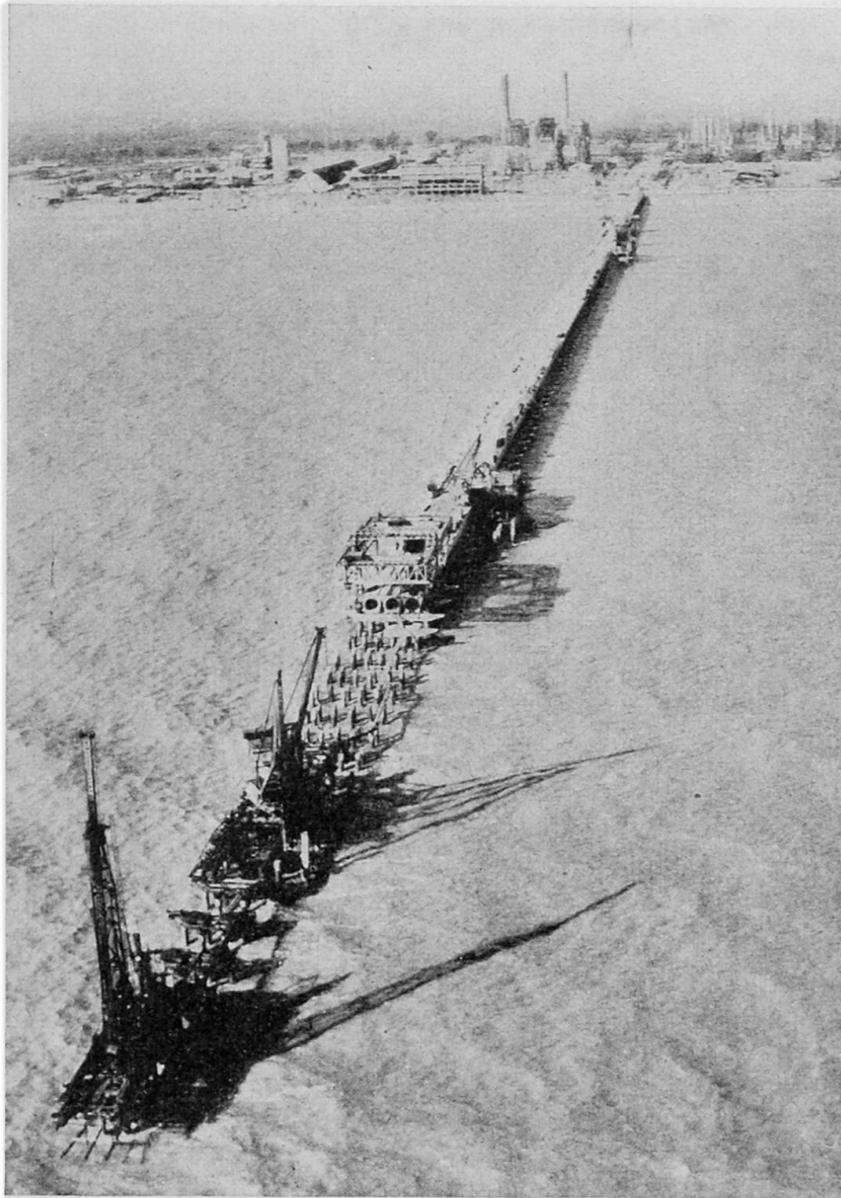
ANIC loading dock at Gela. Driving of prestressed foundation piles.
